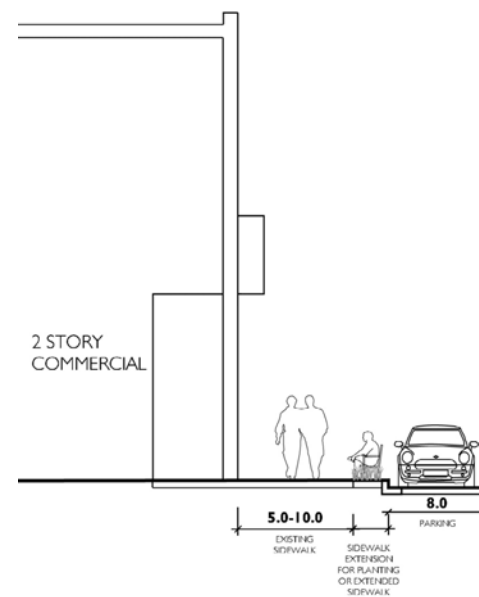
New Street Furniture and Landscaping Located in the Widened Sidewalk
